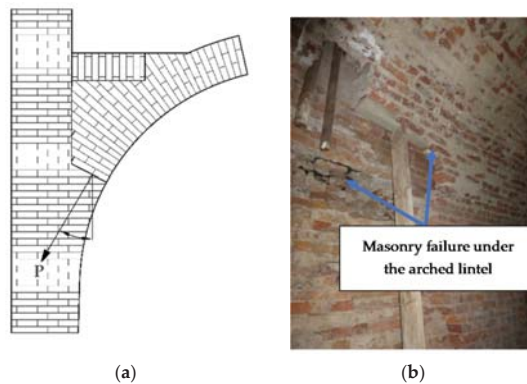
Arched lintels support zones in masonry (a) diagram; (b) example of failure mechanism.
